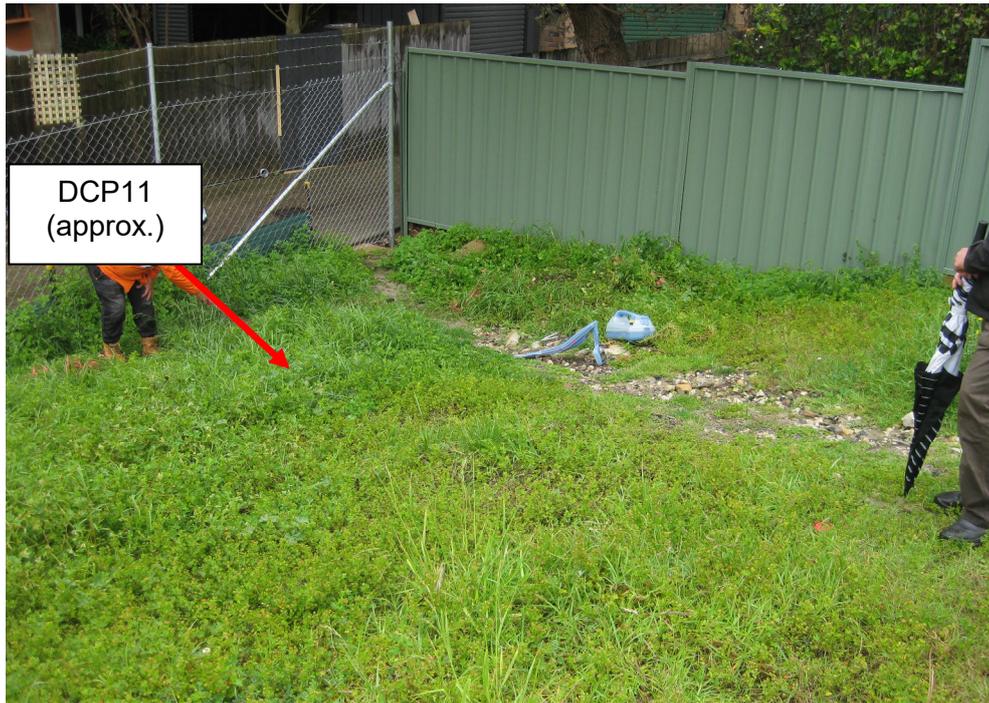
View south-west towards laneway and southern property boundary. Historical test location indicated as shown.
